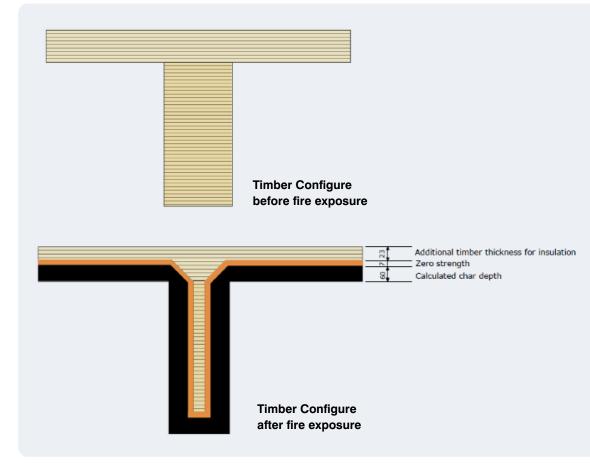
Insulation provided by the minimum thickness of the floor panel.
